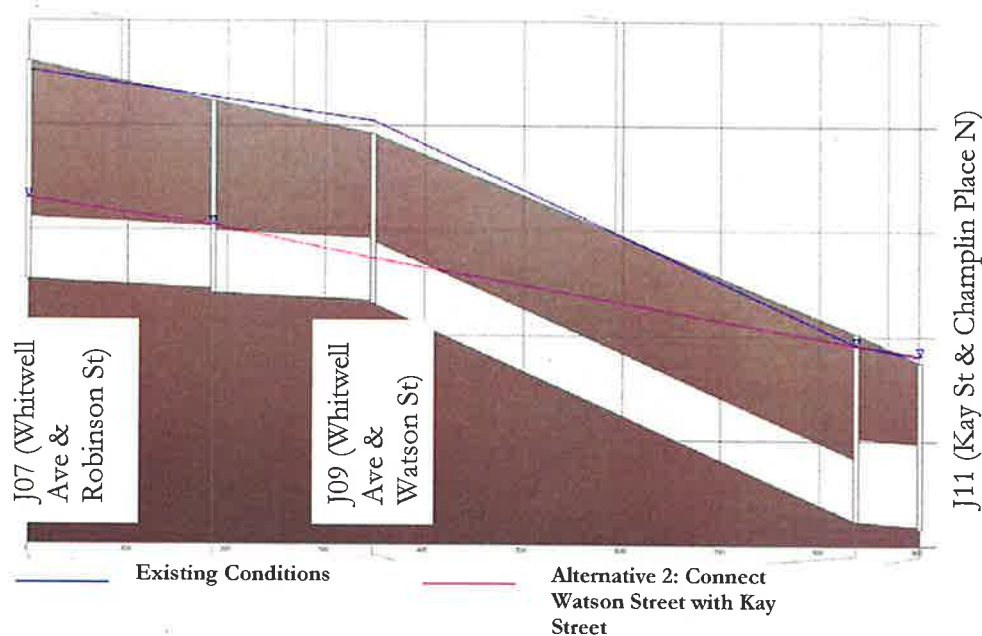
Hydraulic Profile from Robinson Street to Kay Street for Alternative 2 (10-Year Storm)
